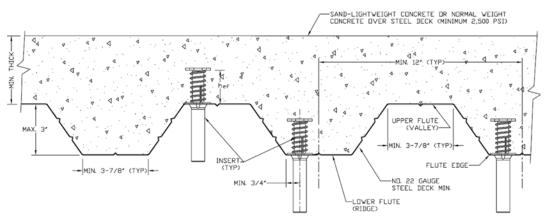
C—BANG-IT+ INSERTS INSTALLED IN SOFFIT OF CONCRETE-FILLED STEEL DECK FLOOR AND ROOF ASSEMBLIES^{1,2,3,8,9}
